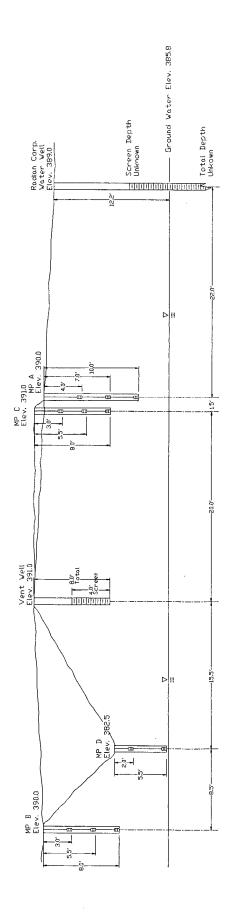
Cross Section of Vent Well and Monitoring Points at the Power Plant Site Showing Elevation Differences
